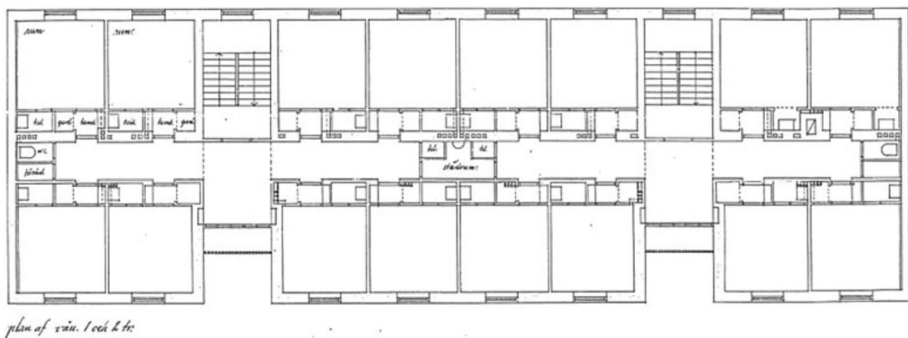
The student house *Gubbyllan* in Övre Slottsgatan, Uppsala. Plan from the original planning application in 1929 showing the first and second floor (Uppsala City Archive)
